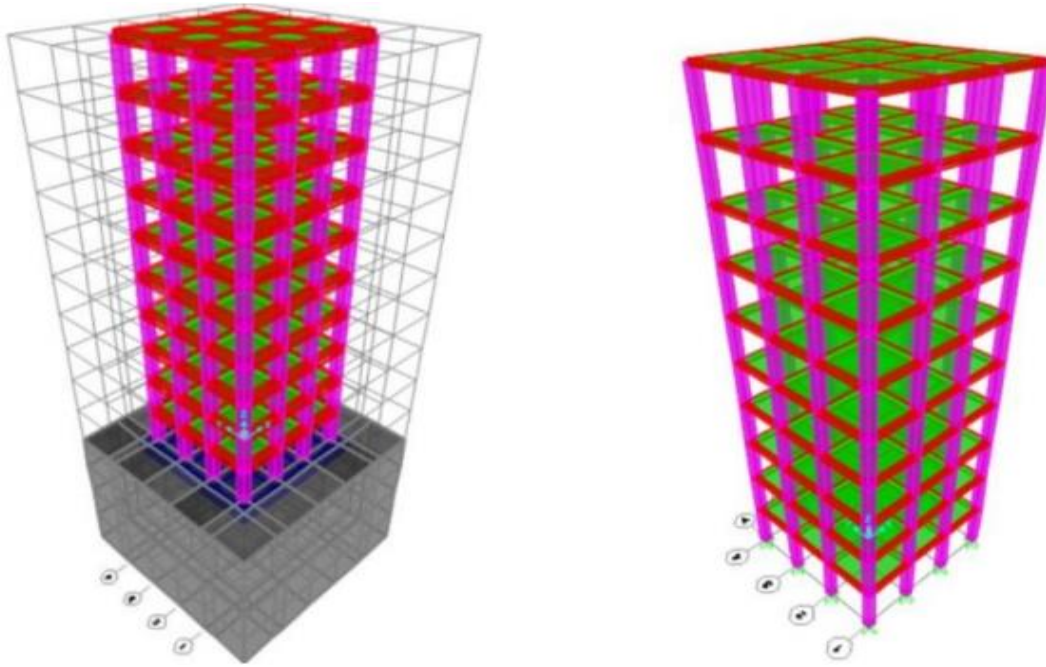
Model of a structure (a) with soft soil and mat foundation (b) with fixed base
